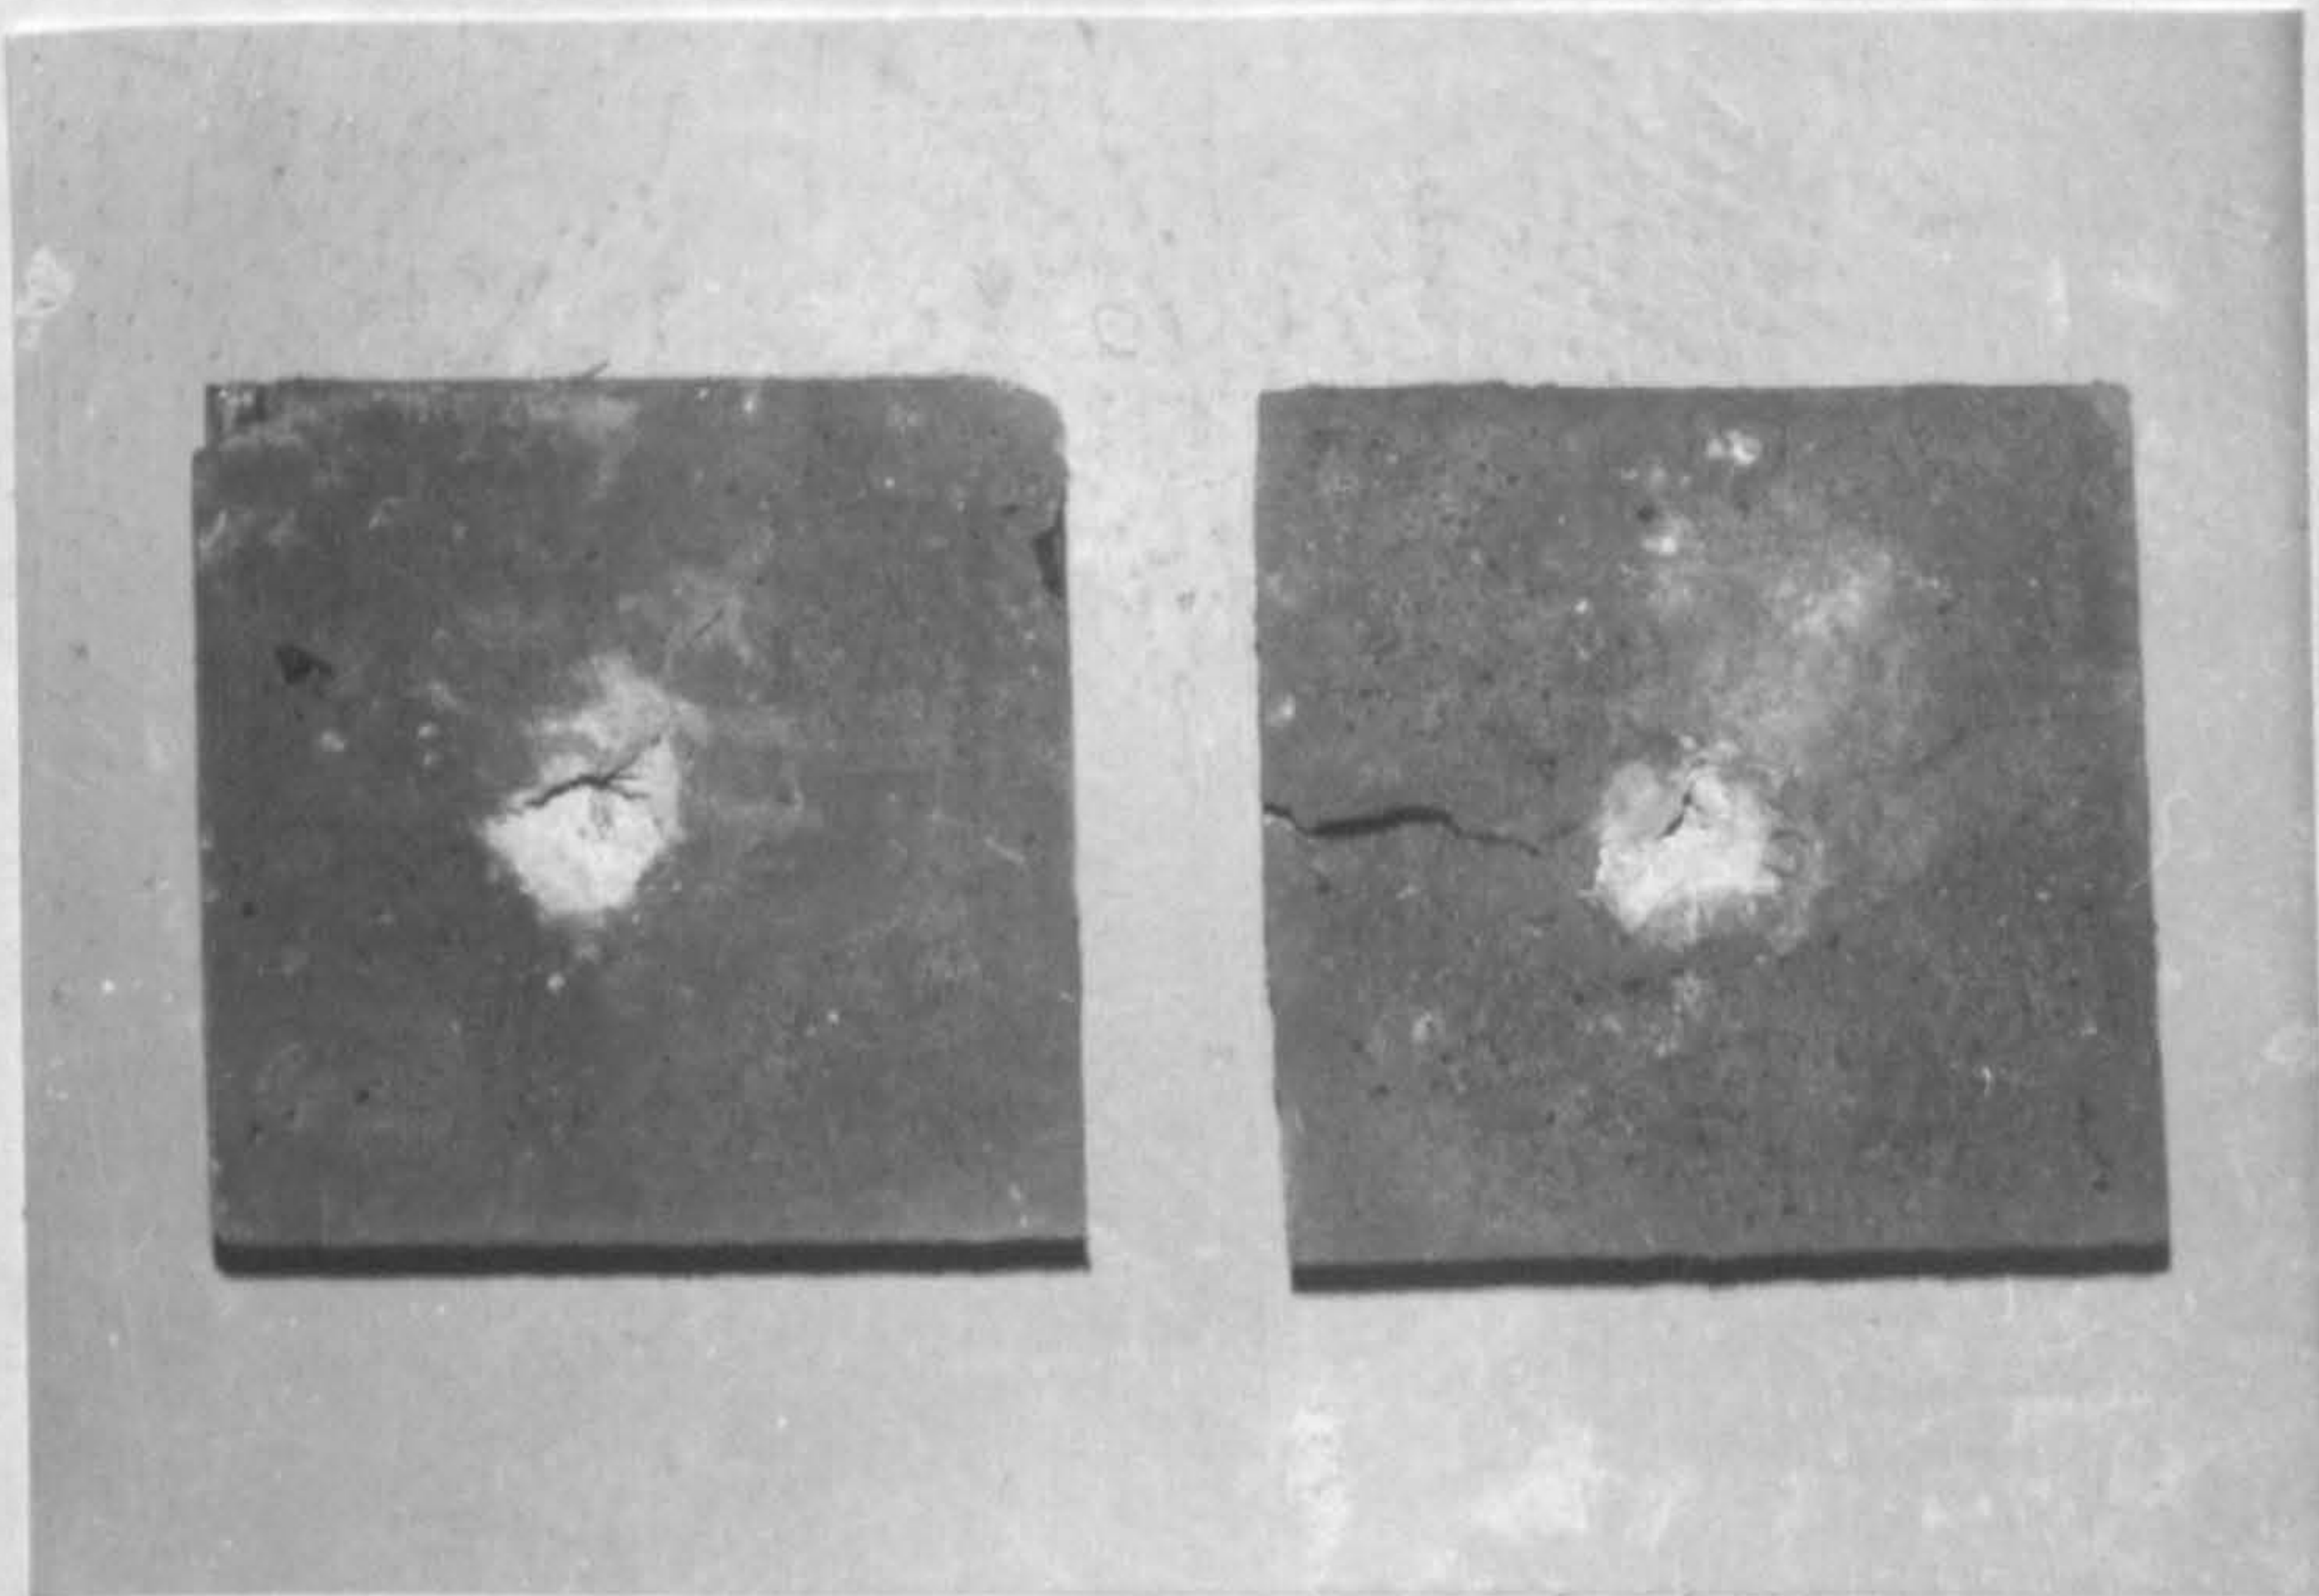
TYPICAL IMPACT FACE DAMAGE, SERIES 19
